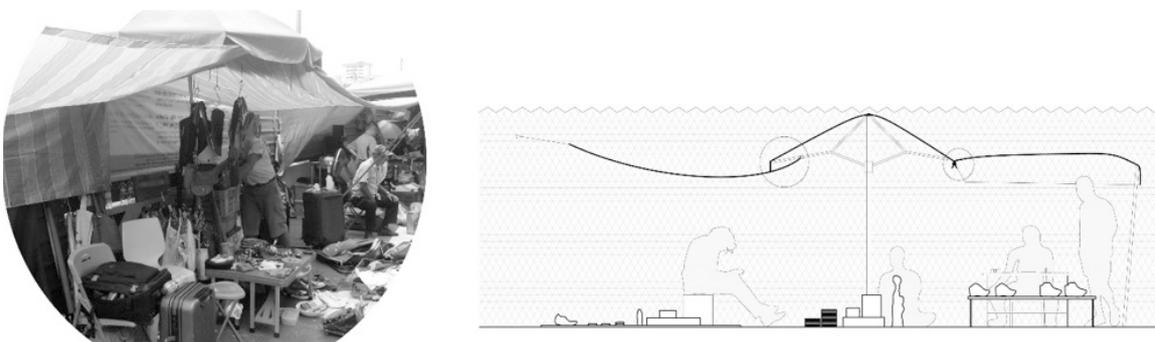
Section drawing – Mutual-help in shelter structure Type 3 (Illustration: Liaw Su Xin)
